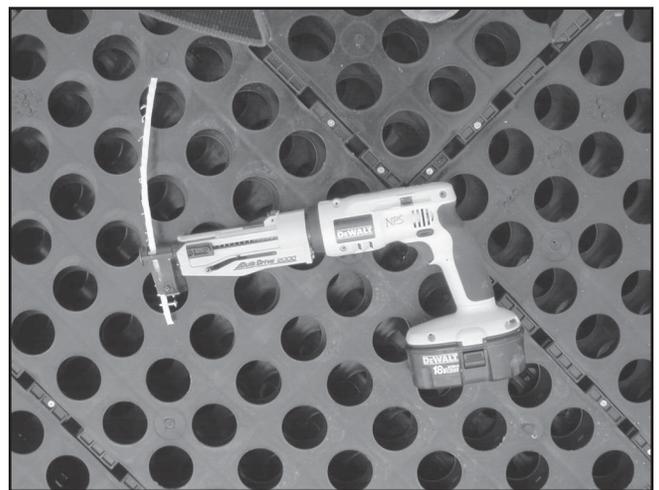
The Quik Drive automatic-feed screw gun speeds assembly of the panel subsections.
